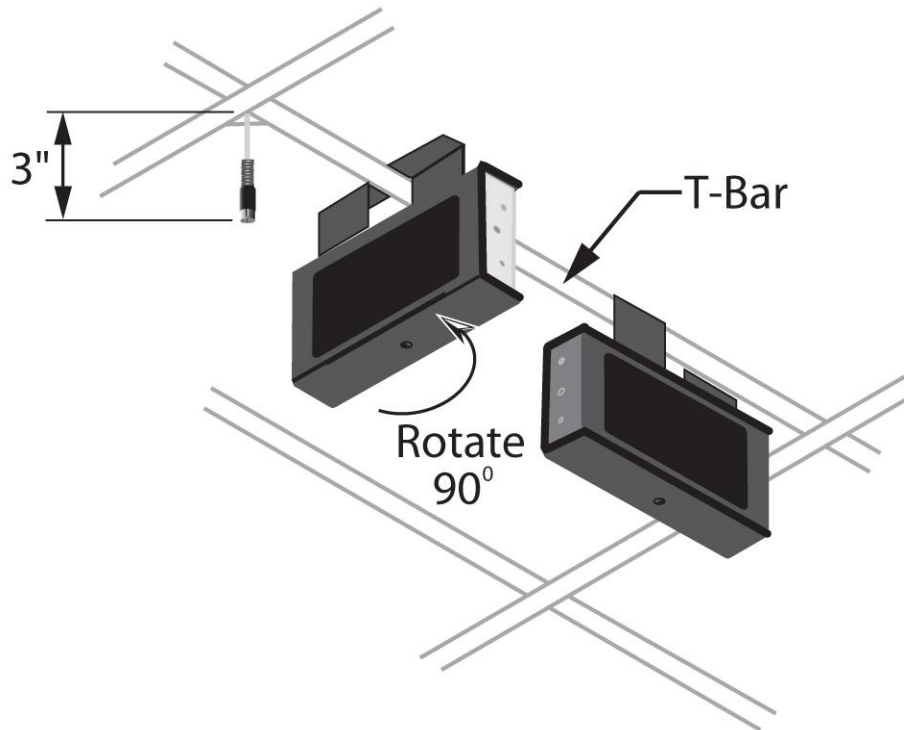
Installing T-Bar Mounting Brackets to Remote Display
